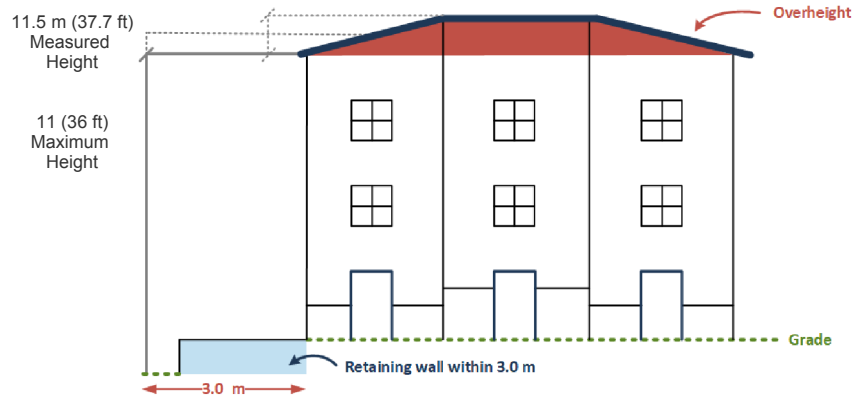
Commercial Building with Retaining Wall Not in Compliance with Zoning Bylaw
